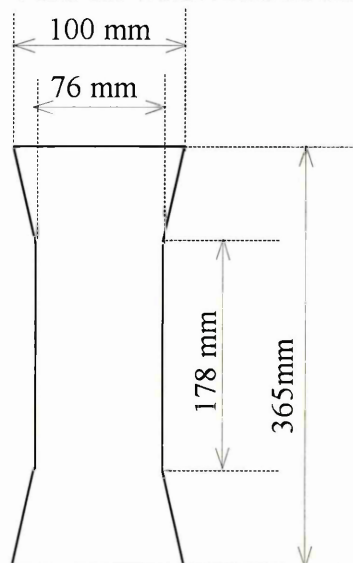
Dimensions of the bobbin shaped concrete specimen⁹³
